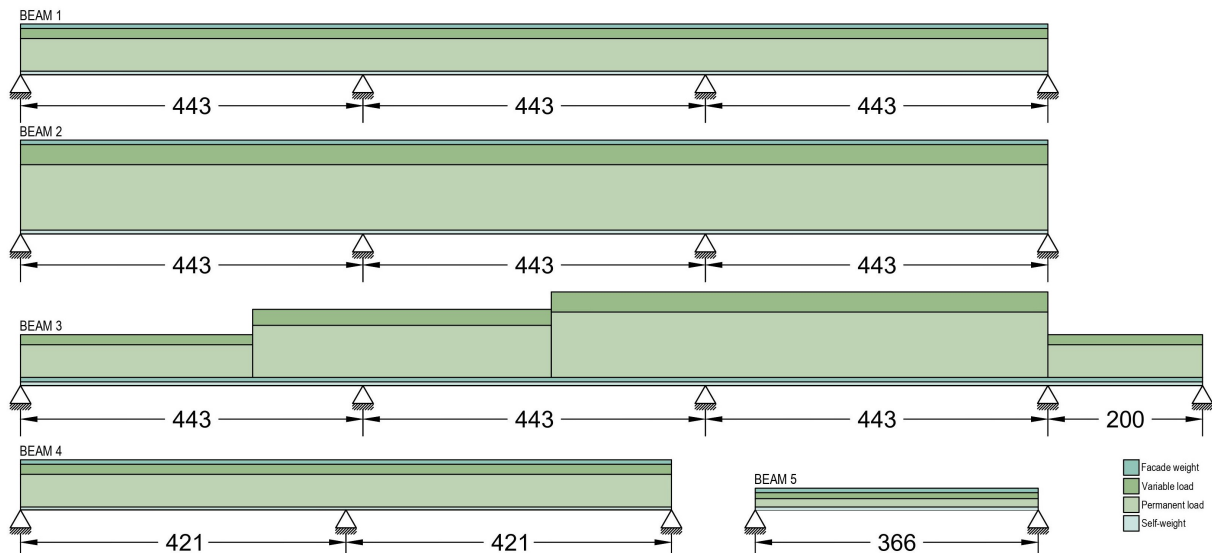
Sketch of concrete beams with indication of the corresponding loads - L01
